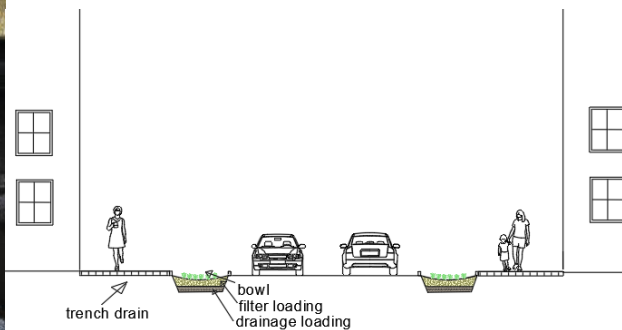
The layout of the biodrainage swales in the street profile (Ramikh M.A.)
